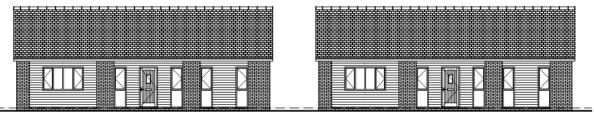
West elevation of live-work units – towards Little Tarrington Road
